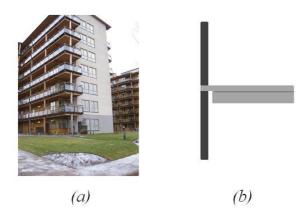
Limnologen, (a) photo of the building (Albrecht, 2009)(b) how the floor is placed between two wall elements.
